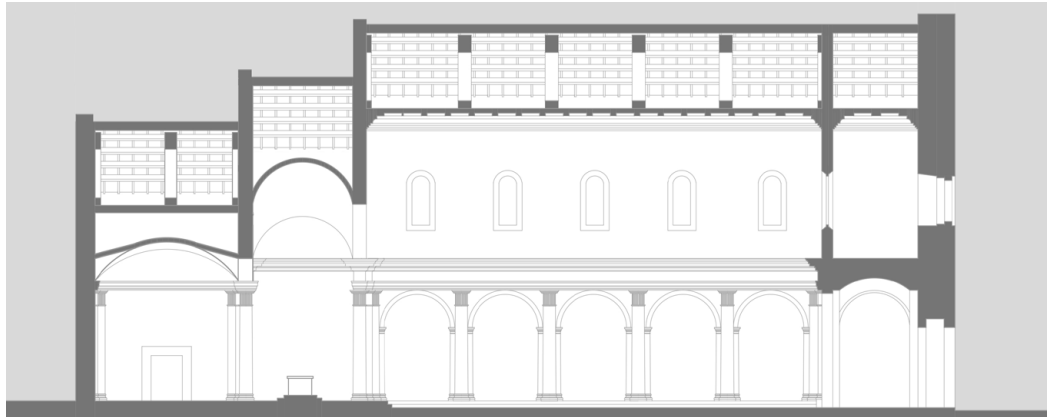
Church of San Gallo. Reconstructive hypothesis of the interior; view towards the apse, trussed roof, clerestory with single-lancet windows. Elaboration by Ylenia Ricci.
